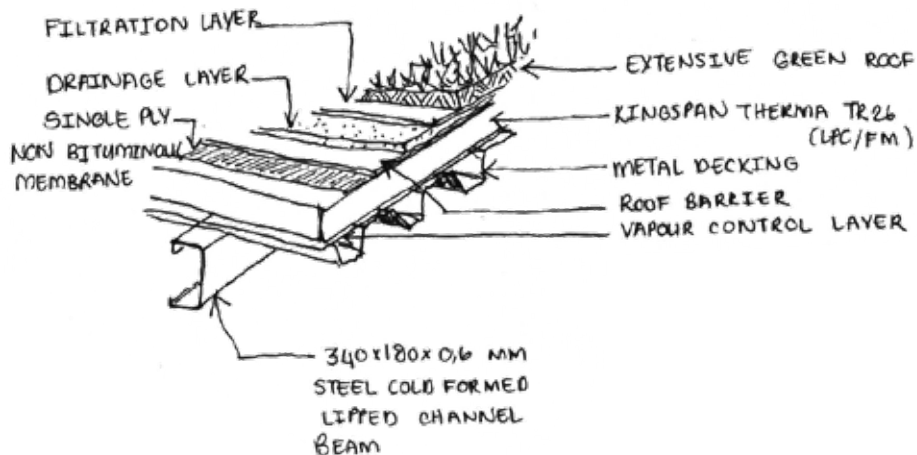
Green roof detail: silkworm rearing Pods (Caldeira, 2019: drawing).
